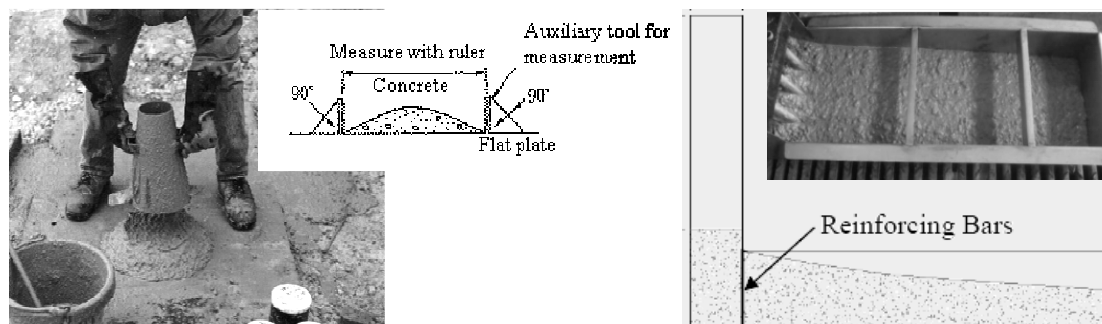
Testing the slump flow, where fresh concrete spreads when lifting the filled cone (left); When opening the gate between the two sections of the L-box, fresh concrete will be discharged through obstructing bars flowing into the horizontal section (right).
